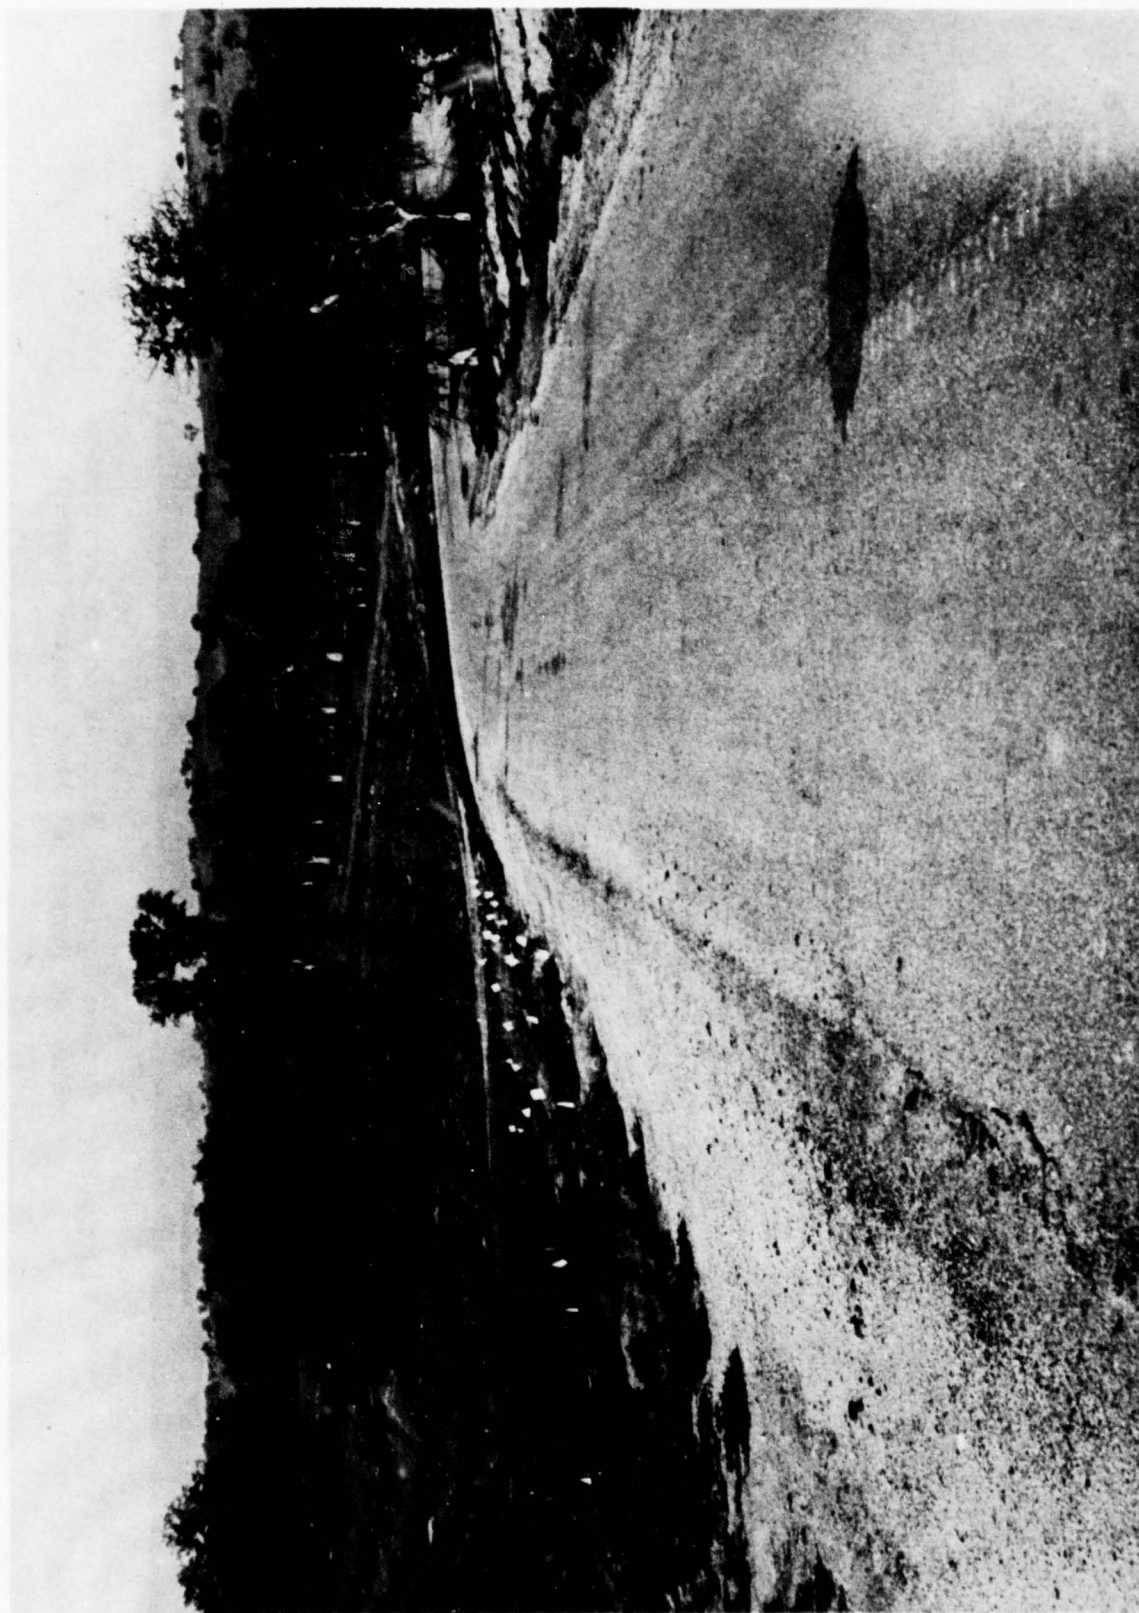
Flagged Ground Squirrel Burrows on a Road Bank at Camp Roberts. NOTE: Repaired Pavement on Roadway.
